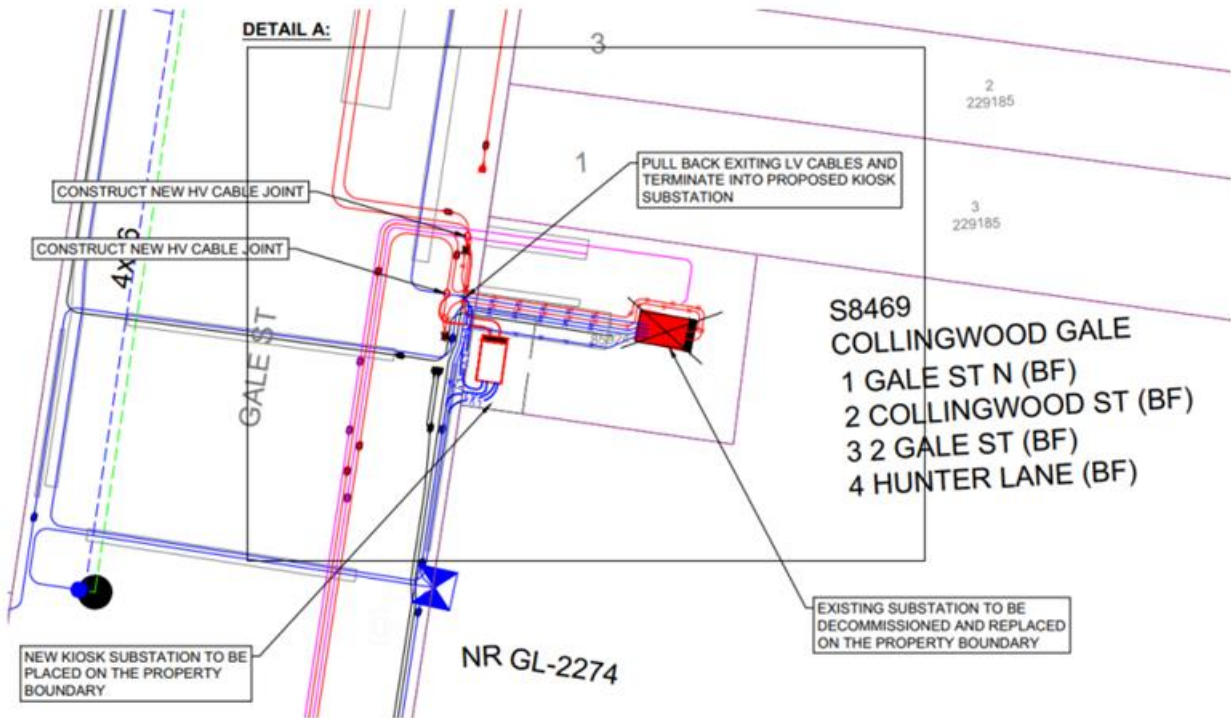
Extract of Proposed Works Plan (Source: SJB (AA Power Engineering))
